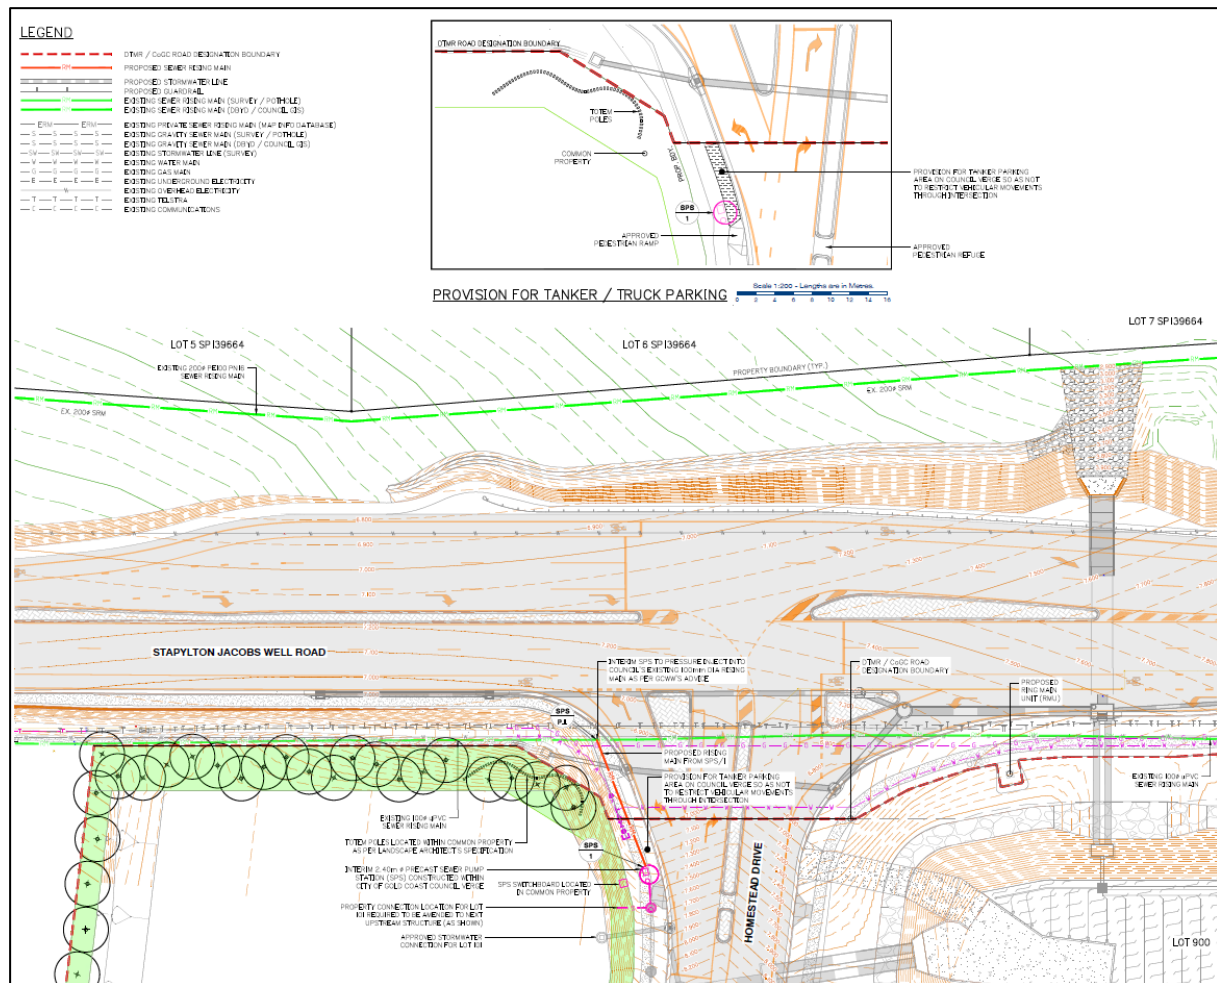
Concept Interim Gravity Sewer Connection for Vantage Stage 1 dated 12 November 2020
